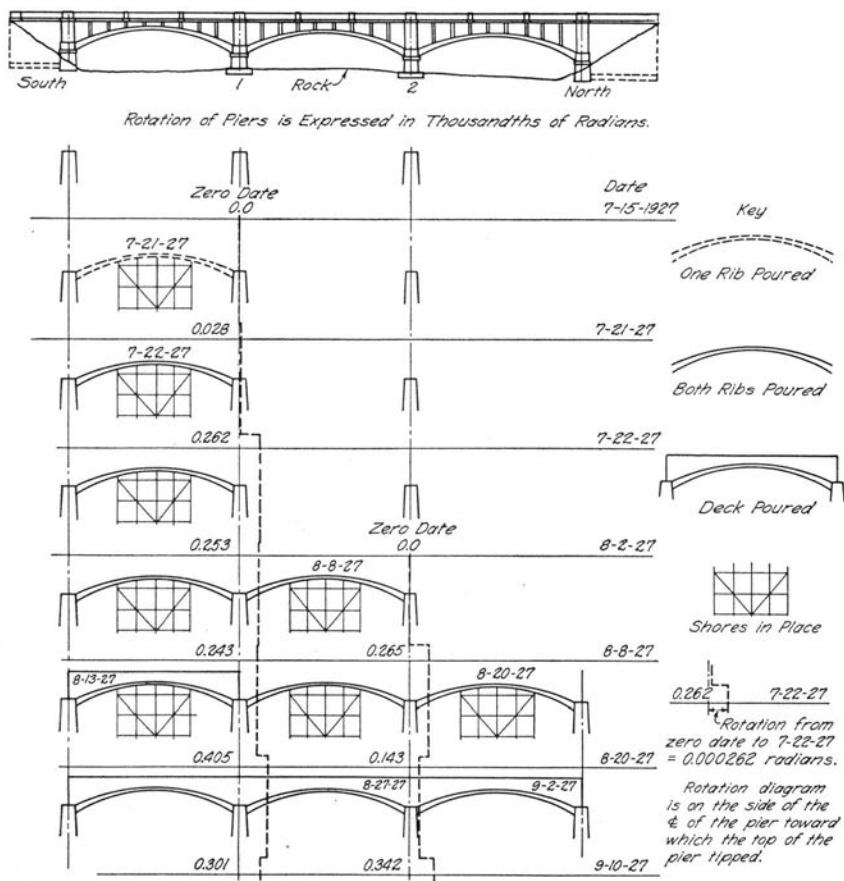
ROTATION OF PIERS, SOUTH BRIDGE, YORKVILLE, ILLINOIS
